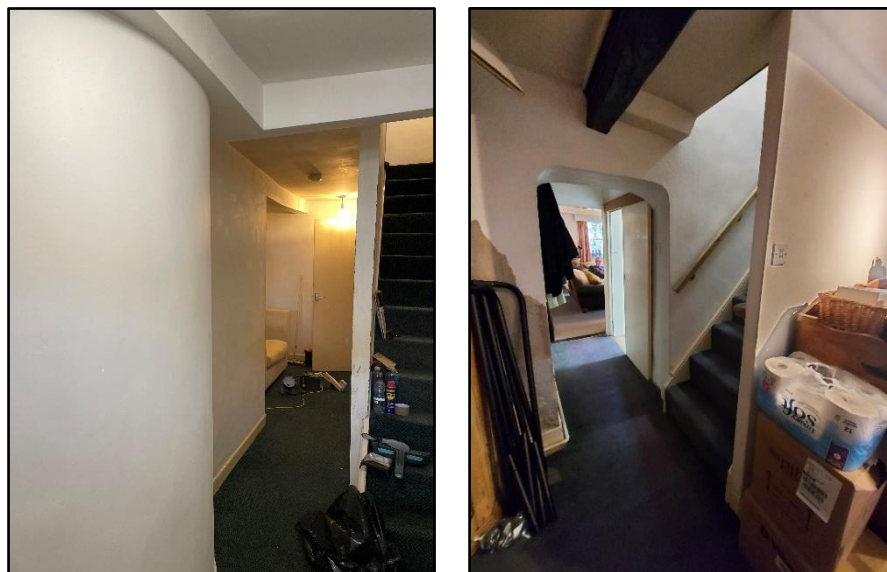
Staircase at 8 Shawbridge Street with the rear of the semi-circular niche (left); Staircase going up to the first floor at 10 Shawbridge Street (right)
